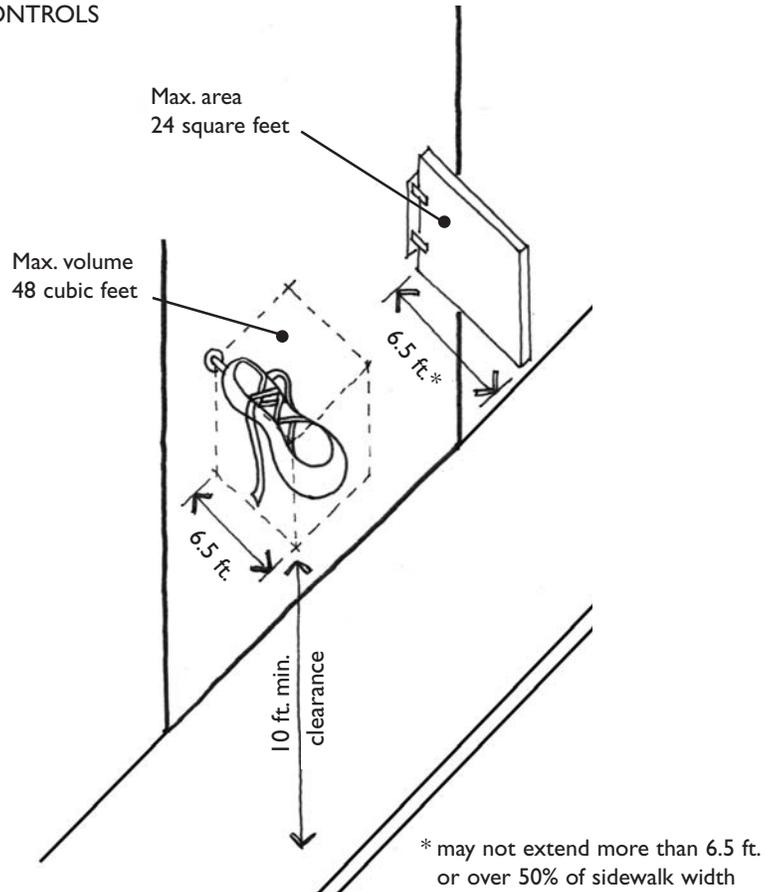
RETAIL FACADE SIGNAGE CONTROLS
